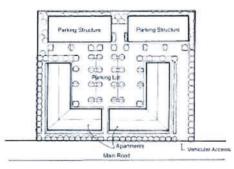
Example Multi-family Building Orientation and Parking Lot Layout
